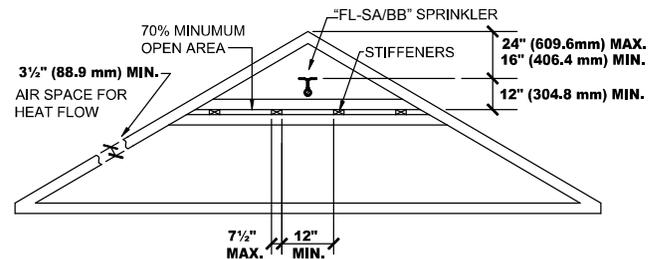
DEFLECTOR ABOVE STIFFENERS AND HORIZONTAL WEB MEMBERS (NO OBSTRUCTION)
